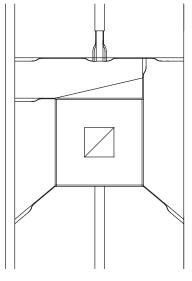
Chimney with back gutter, connected in double standing seam technique with roll cap adapter – suitable from ≥ 3° roof pitch
